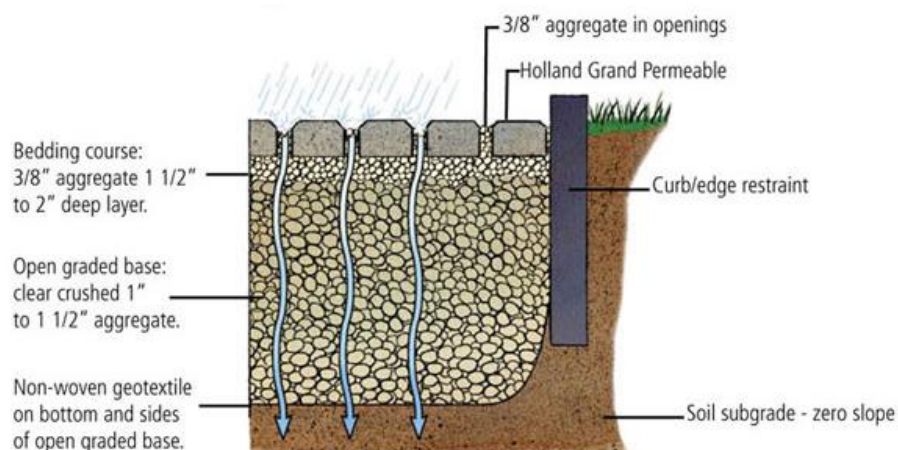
Typical green permeable pavement scheme (Source: www.ercisconcretepavers.com).
